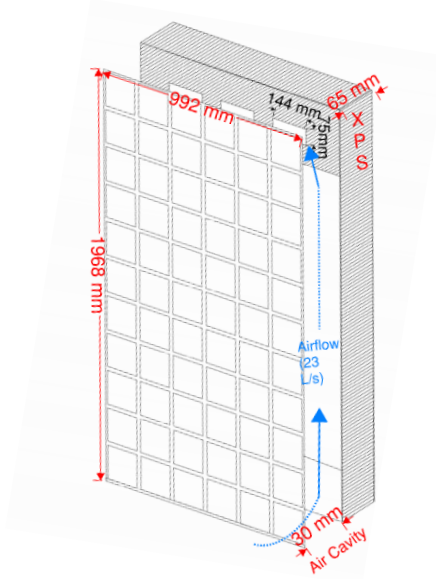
BIPV/T curtain wall schematic of main layers and airflow
